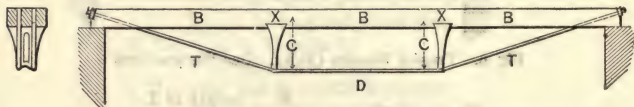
Trussed Wooden Girder. Two Vertical Struts
